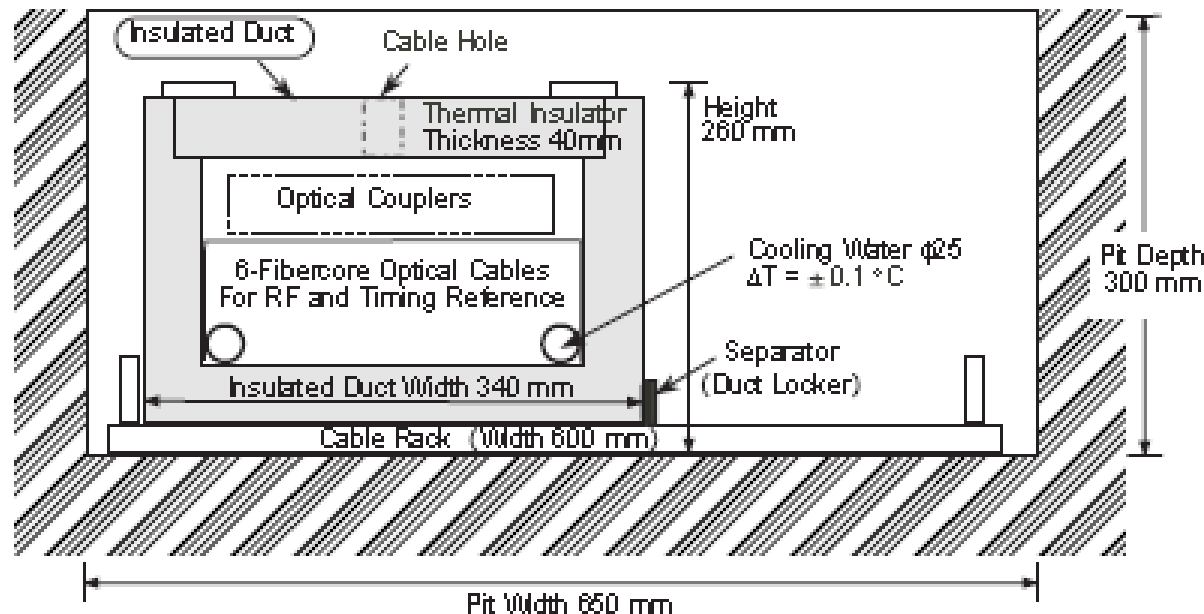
Cross section of the insulated duct set in the under-floor cable trench.
